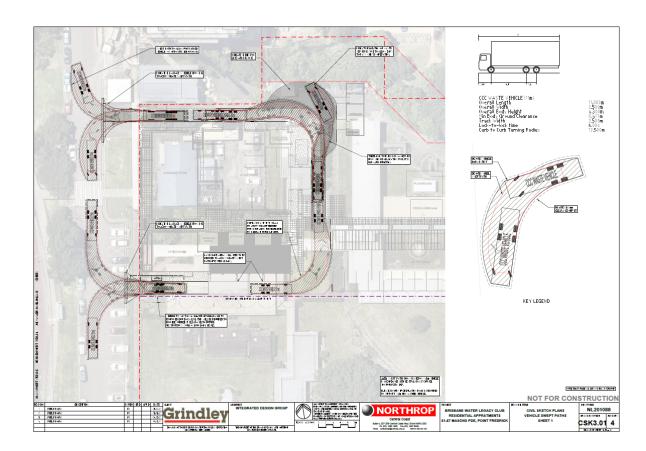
Proposed Waste Collection Travel path – Location of waste collection is under review.
